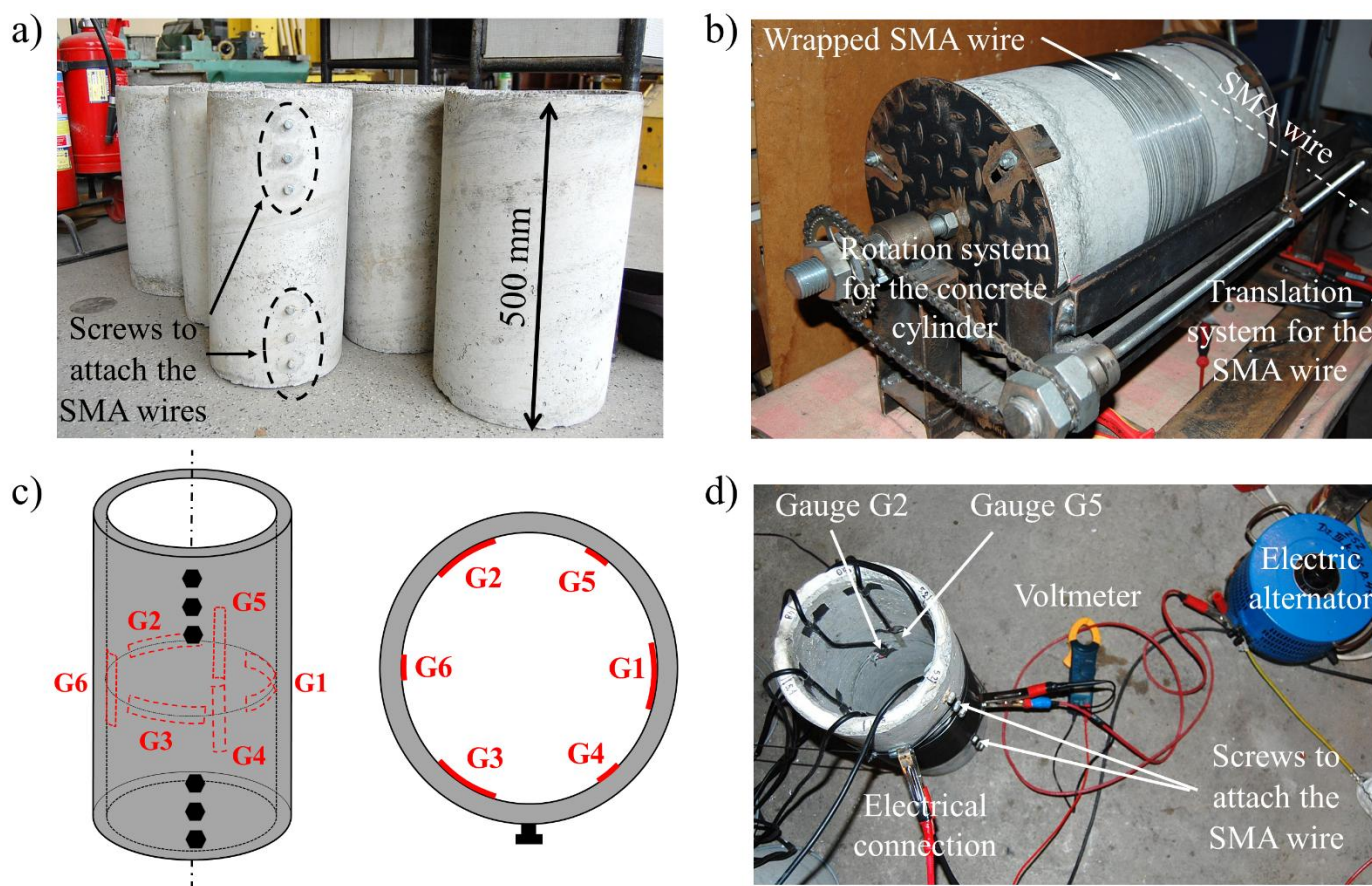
Test details: a) photo of concrete test samples (hollow cylinders) after demolding, with anchoring bolts visible on one sample; b) hand wire-winding machine; c) location of the strain gauges on the internal surface of the concrete cylinders; d) photo of the Joule effect setting for the prestressing of the hollow cylinder
